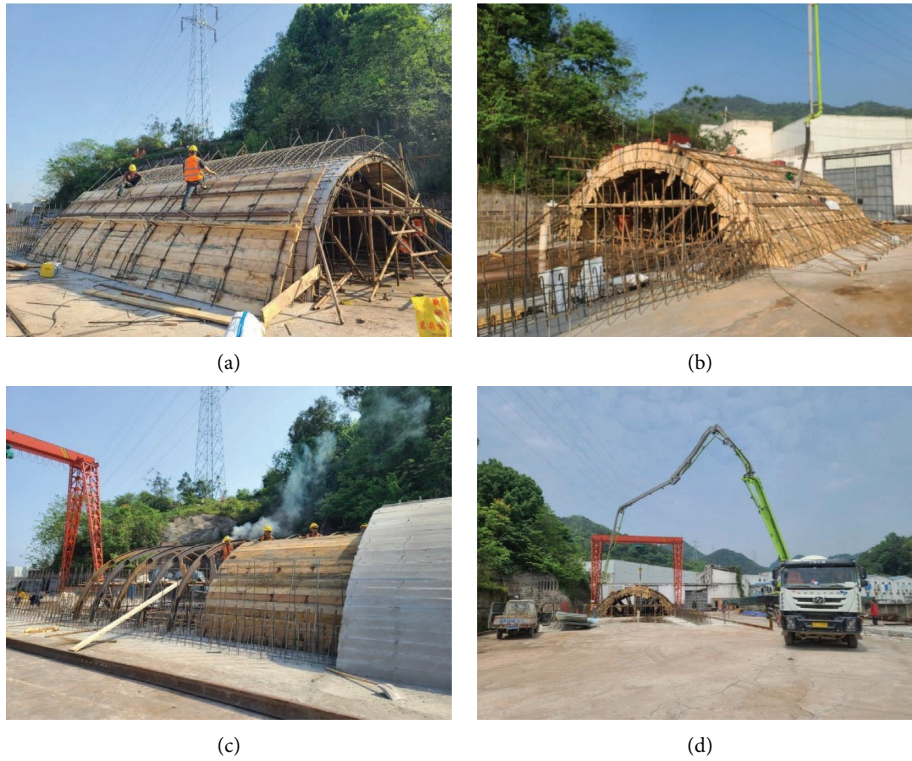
Construction of the experiment model. (a) Lining formwork installation of the first plate. (b) Concrete pouring of the first plate. (c) Lining formwork installation of the second plate. (d) Concrete pouring of the second plate.
